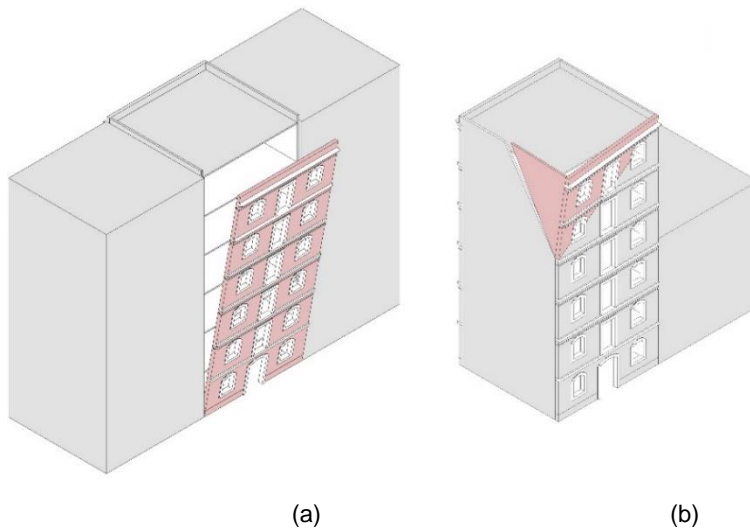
Local mechanisms: (a) Overturning of the facade, (b) Failure of the corner
